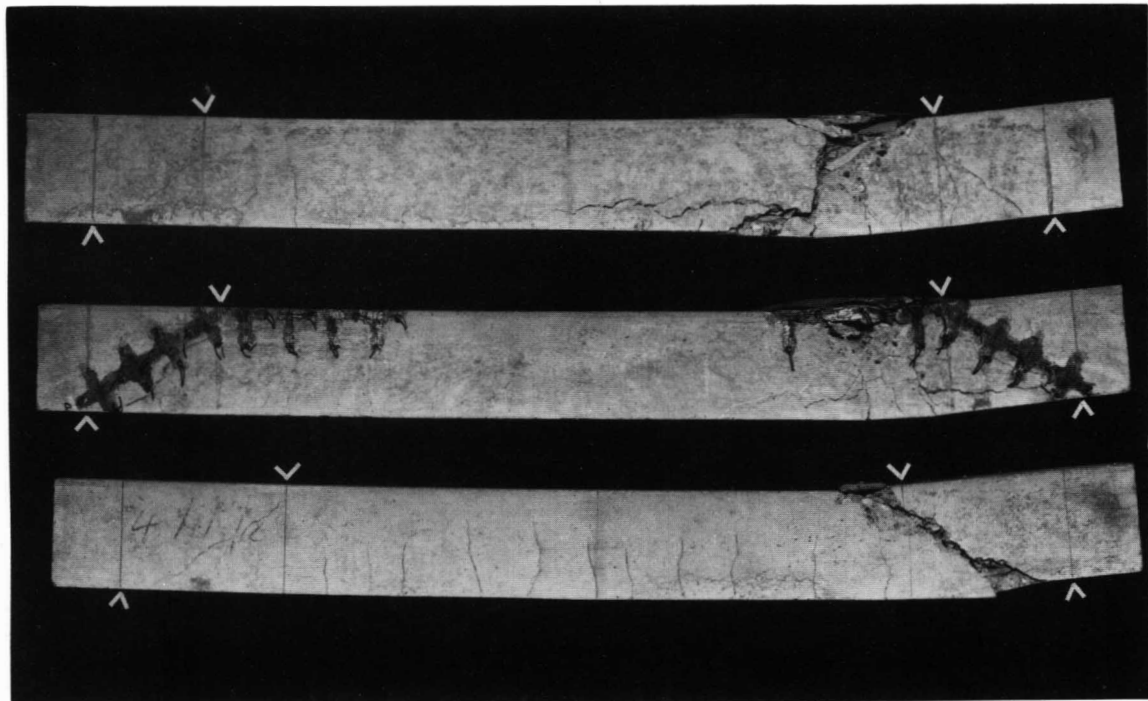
Figure VI: Modes of failure exhibited by beams with stirrups arranged as follows (from top to bottom): no stirrups, with stirrups within shear span, stirrups through beam length.
